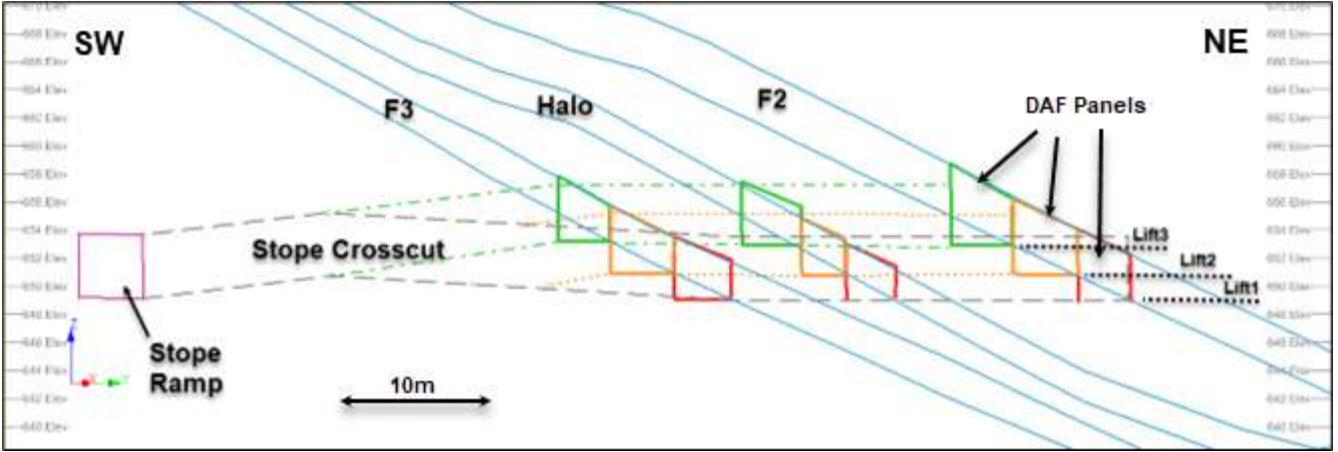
Example Cross-Section of Main-East - Stepped DAF Panels
